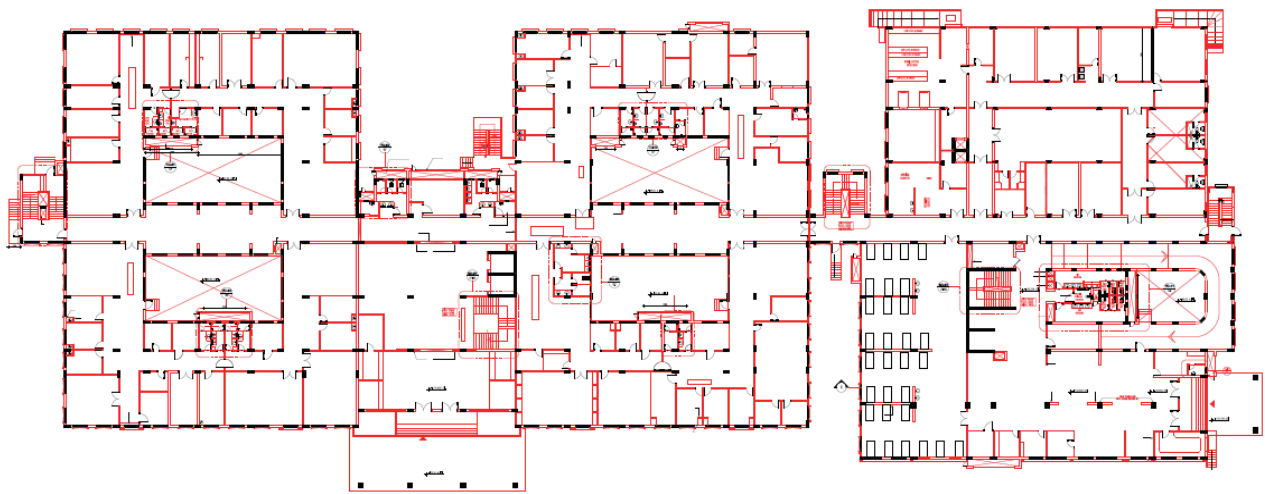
Ground floor plan of Trauma Centre, JNMC, Aligarh
